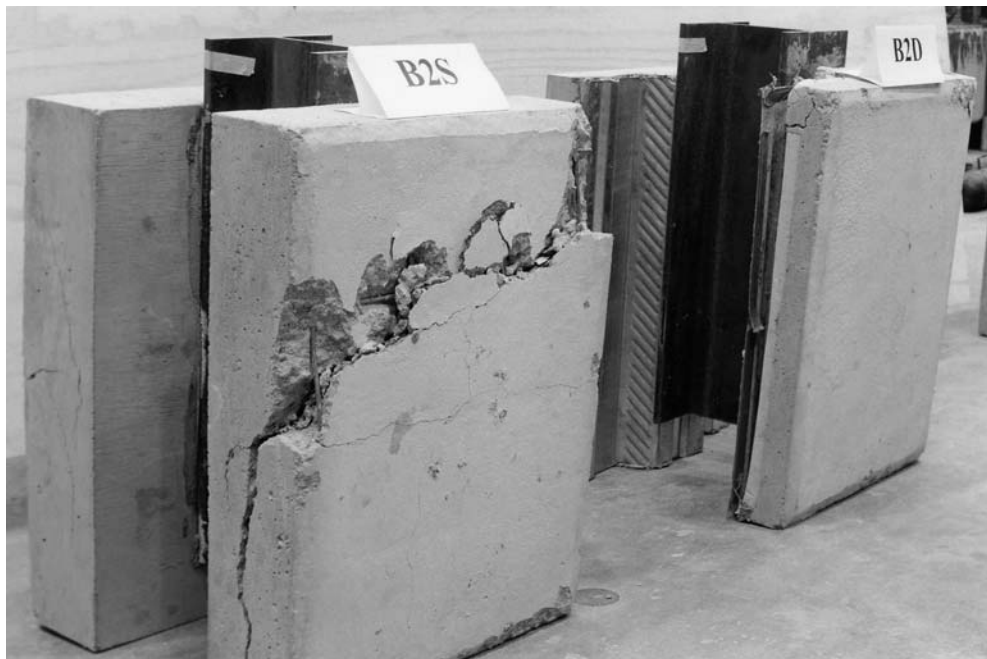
Concrete Crushing Failure of Specimens with Solid Slabs.
